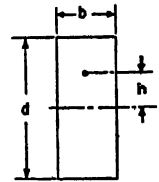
Beam Section Undergoing Longitudinal Shear.
